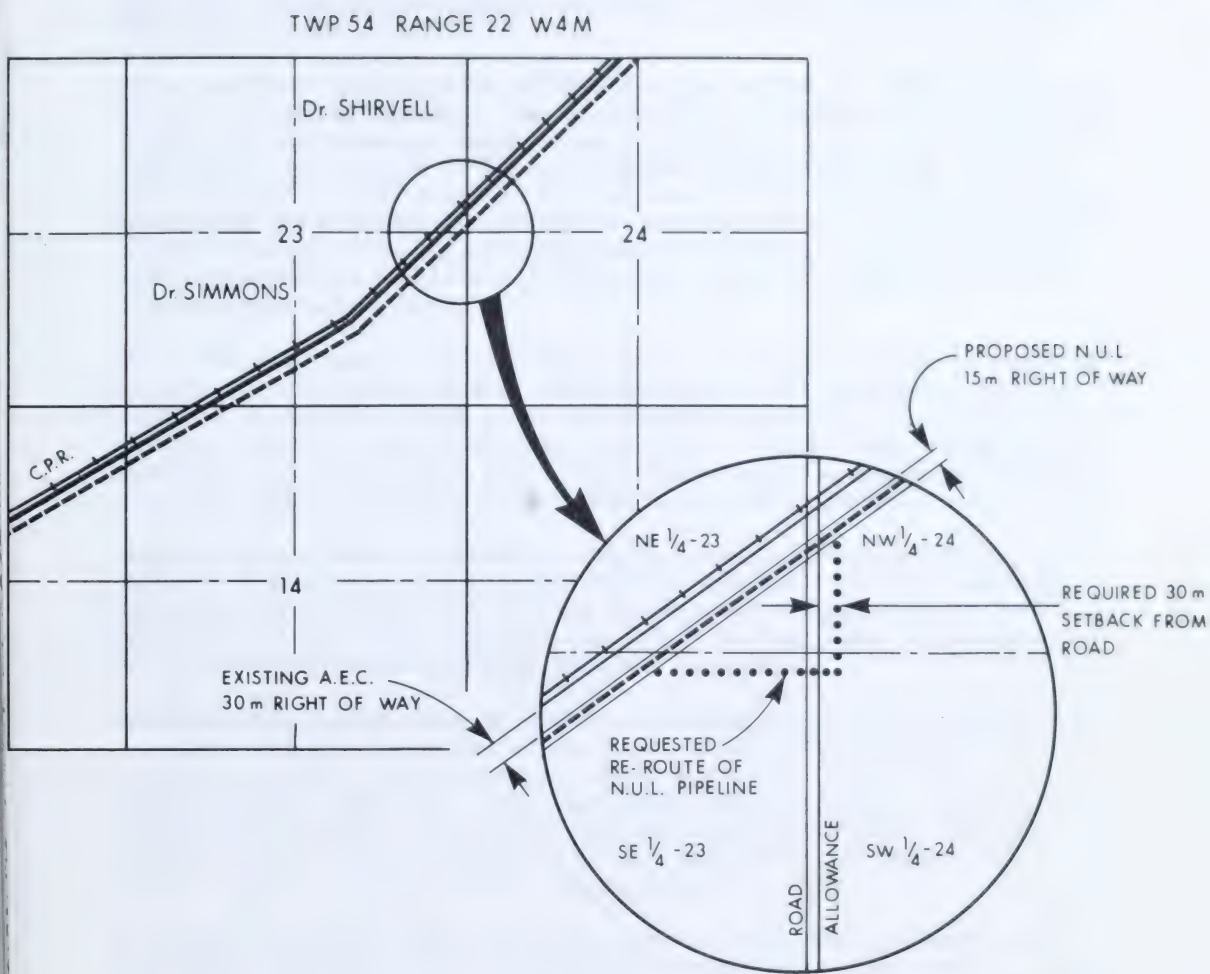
PROPOSED PIPELINE RE-ROUTING
